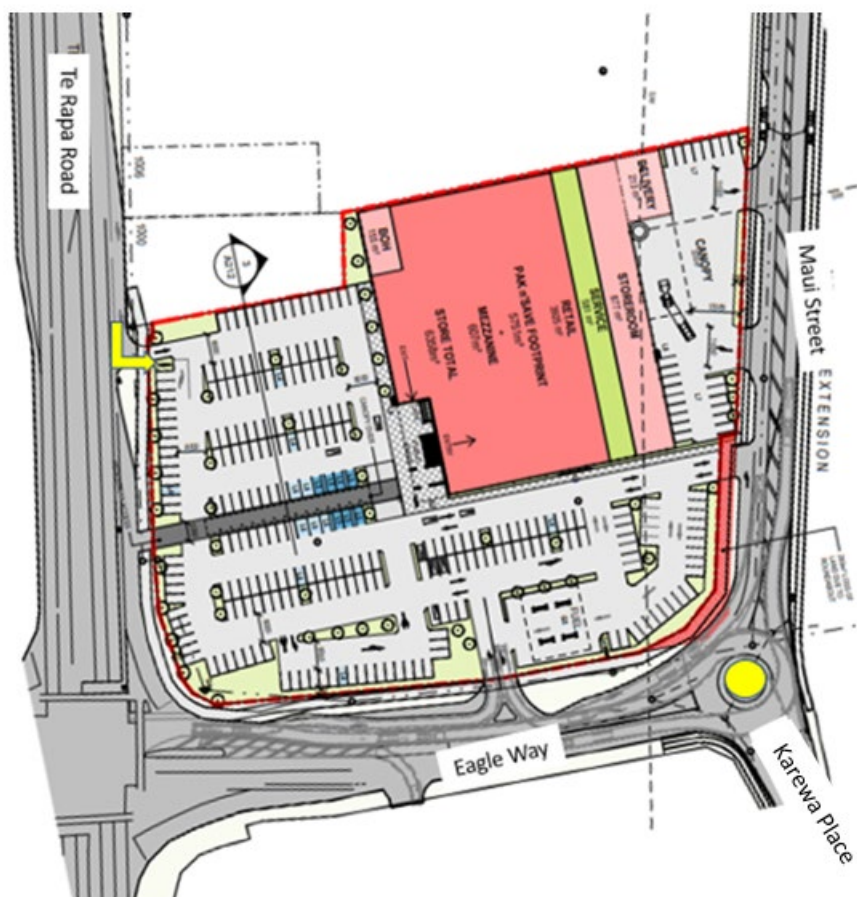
Proposed Pak n Save, Te Rapa site layout.
